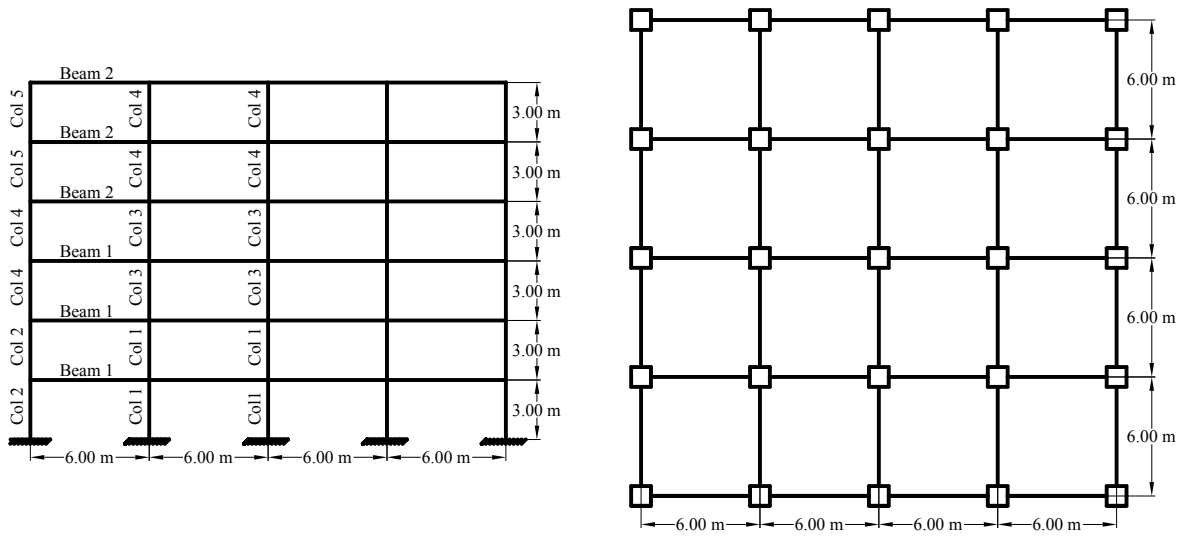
Six-storey RC building Plan and Elevation (Youssef and Elfeki 2012)
